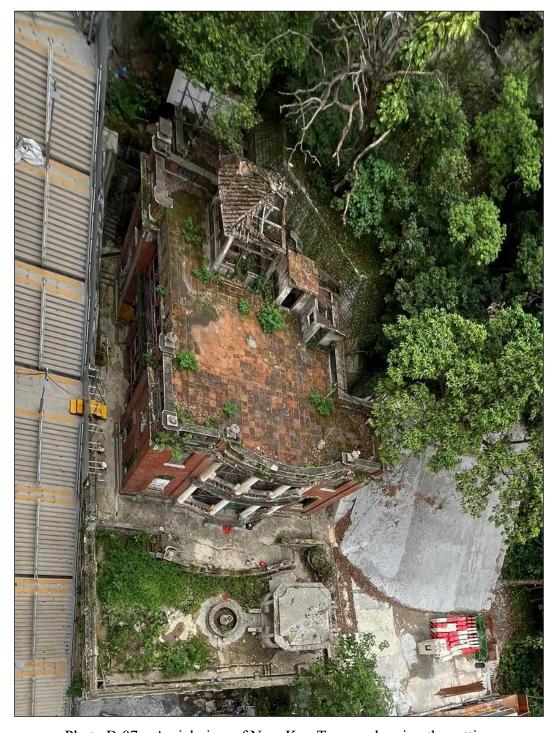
Aerial view of Nam Koo Terrace showing the setting
